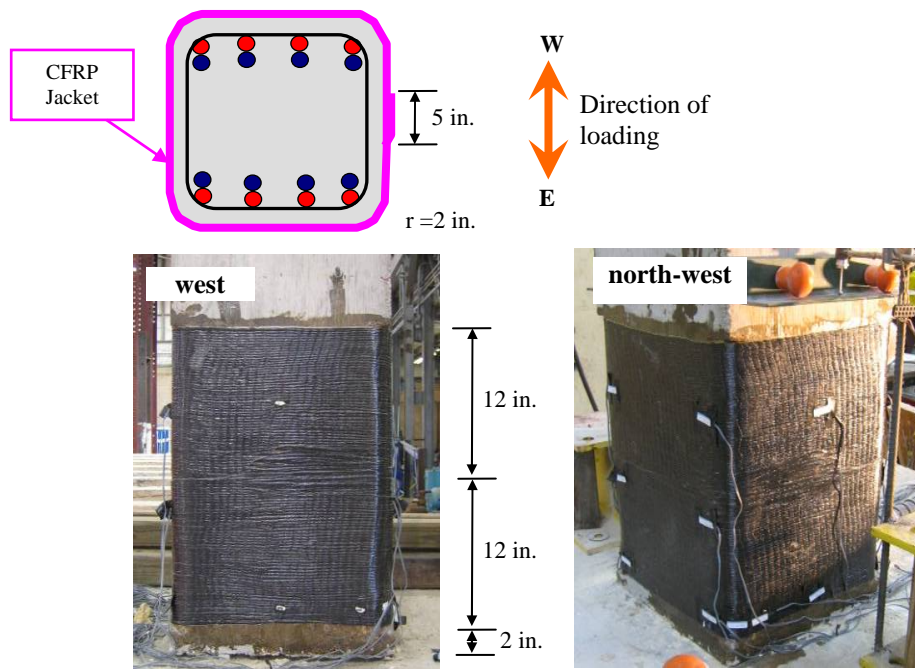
Layout of the CFRP jackets, 1-A-S8-M
